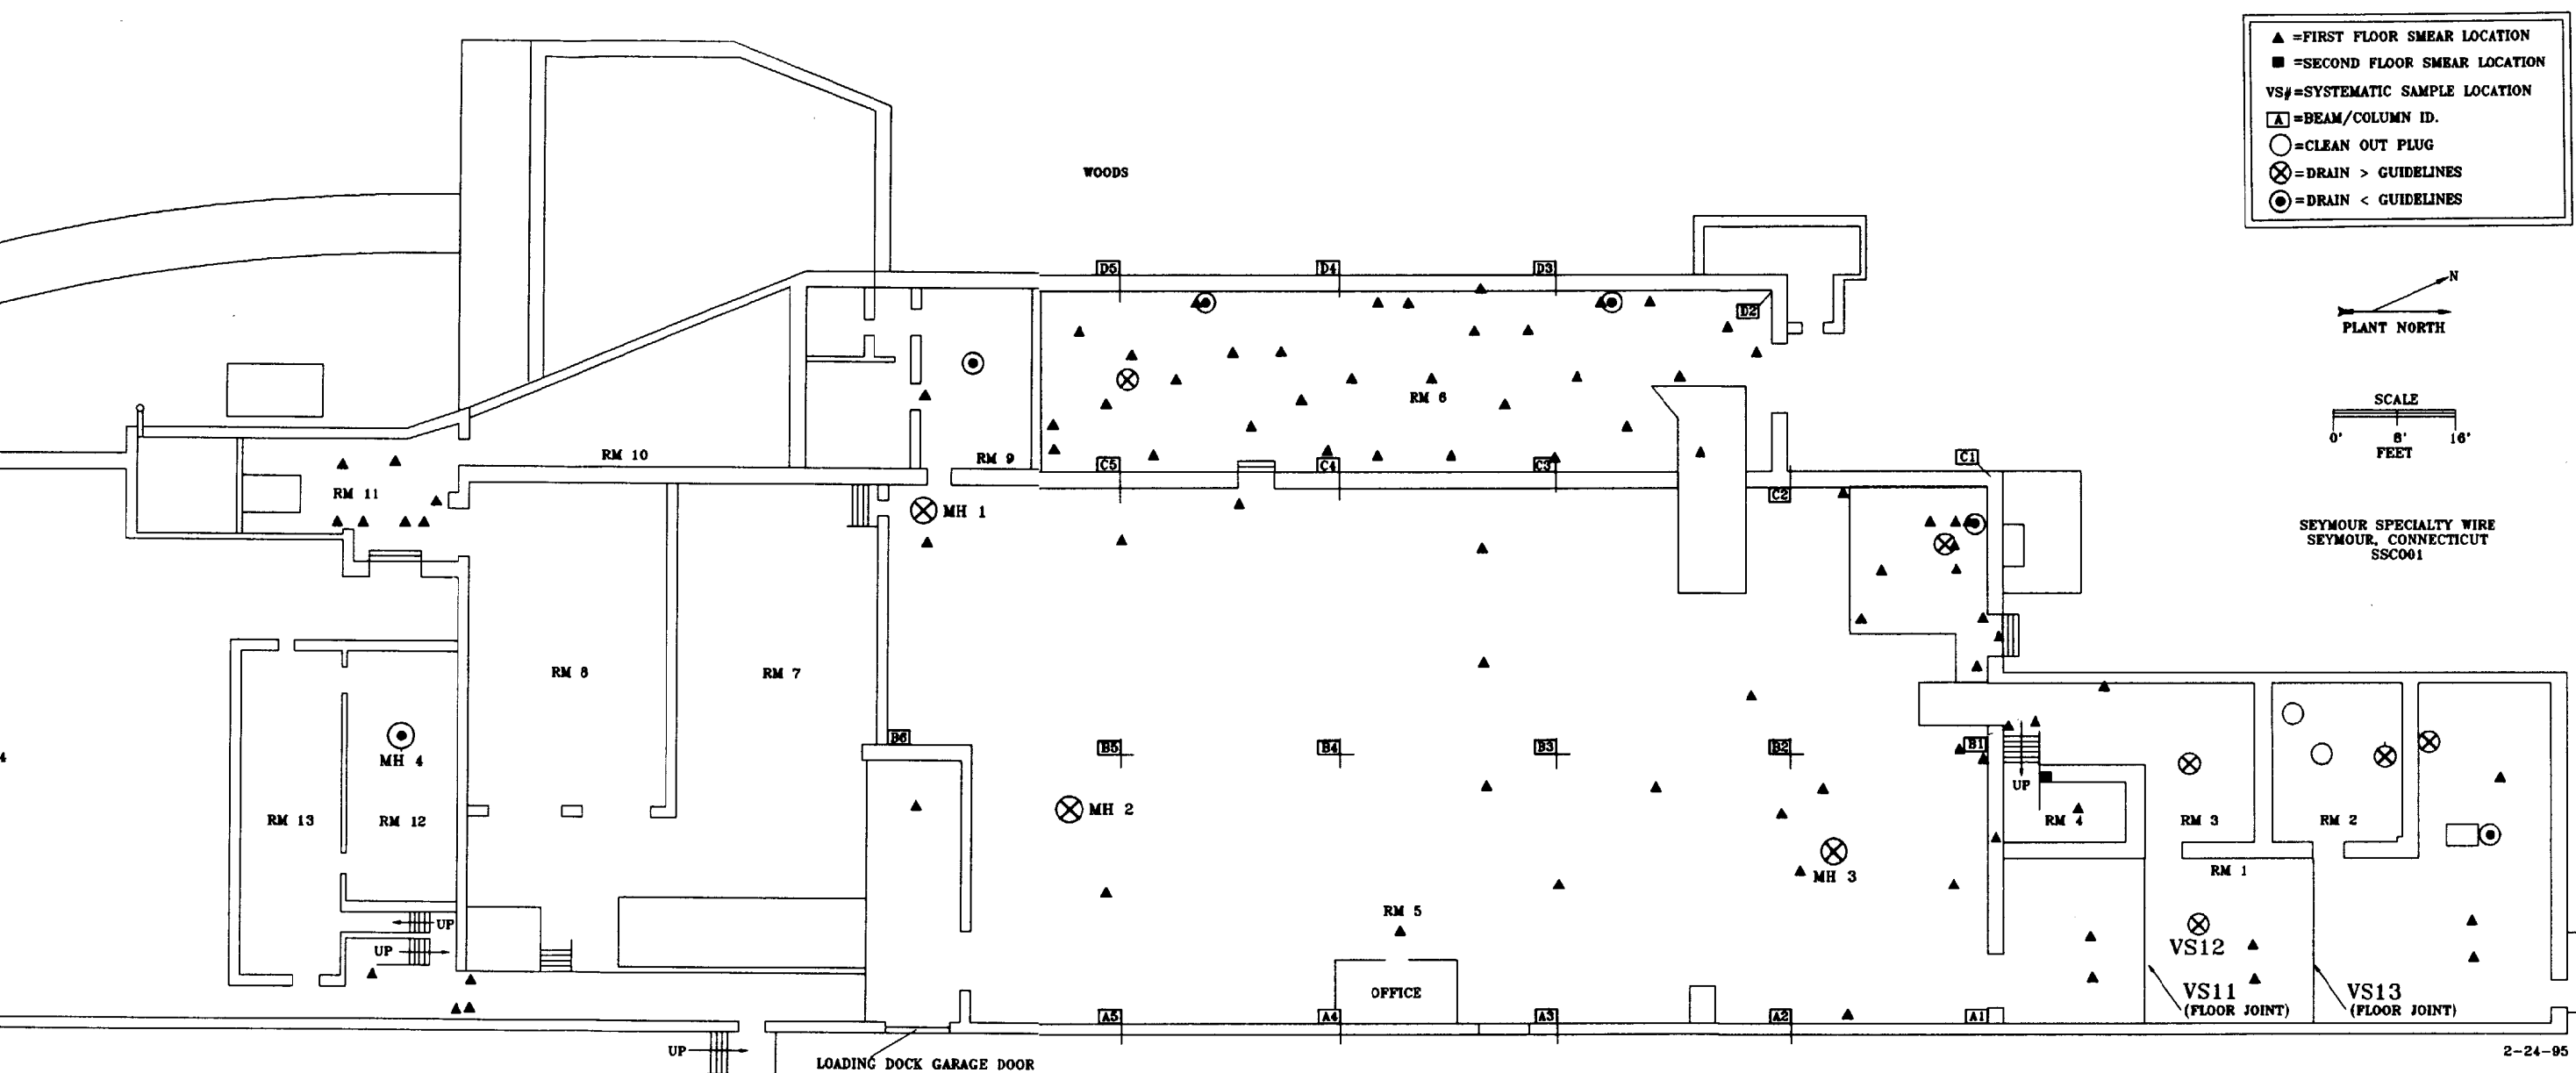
Locations of systematic verification samples and smears from floors inside the Ruffert Building.
